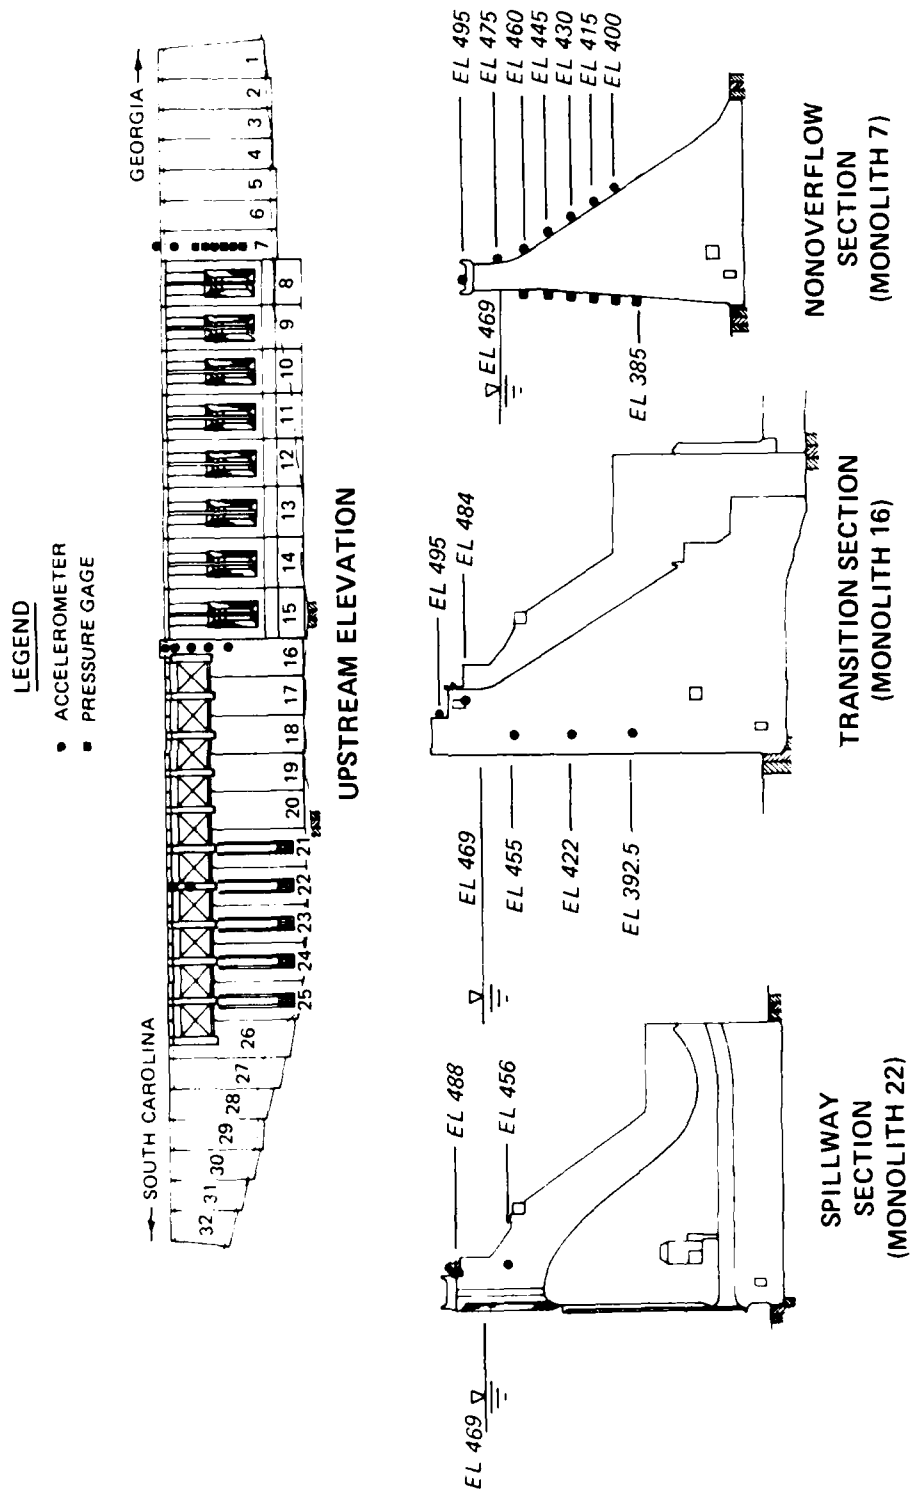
Cross-sectional accelerometer and pressure gage locations for test 2
